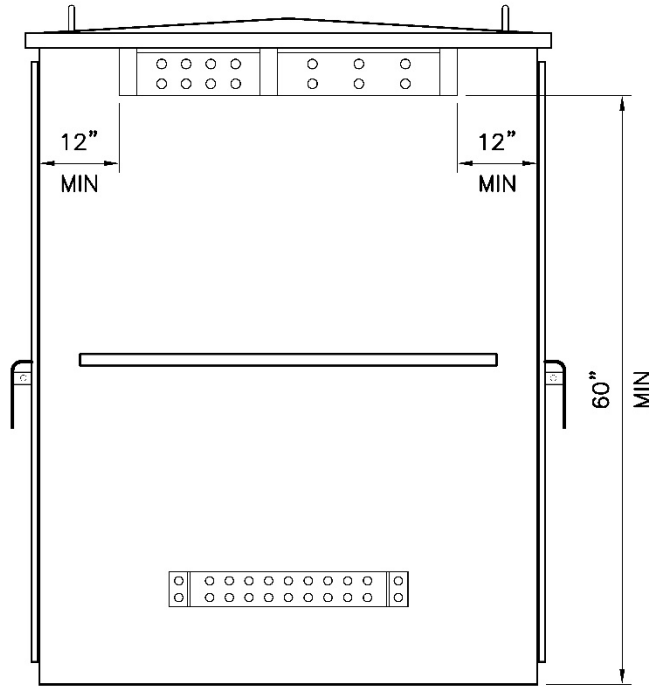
Enclosure with Bus Bars Perpendicular to the Openings, Side View
